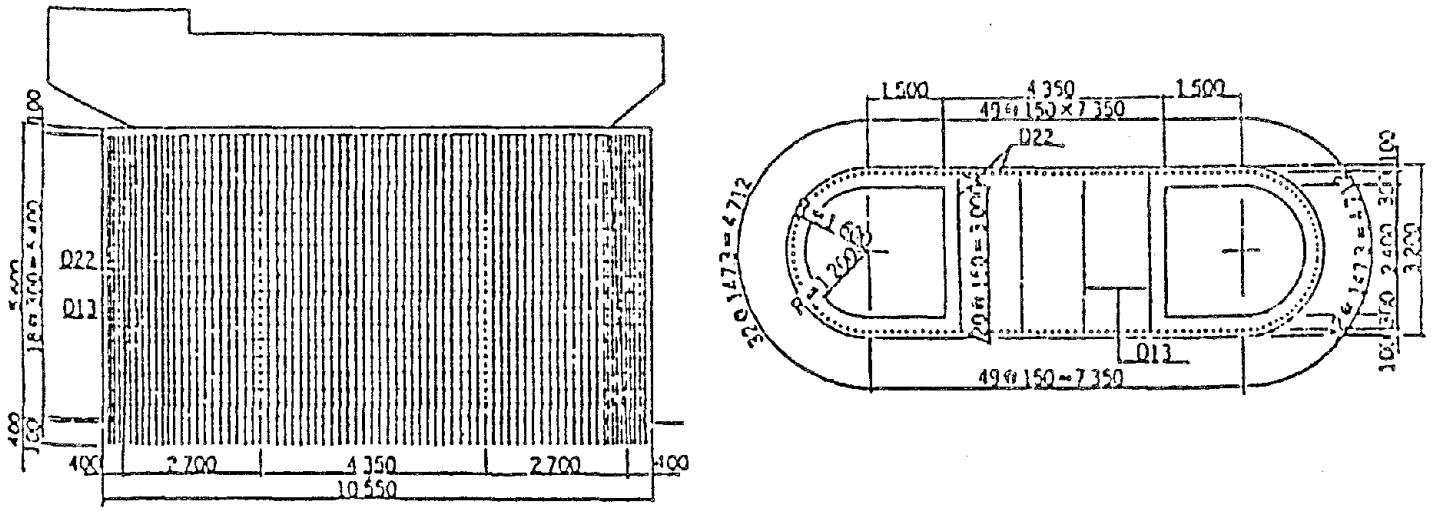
Repair Work of Pier 6 and 7, the Abukuma Bridge
